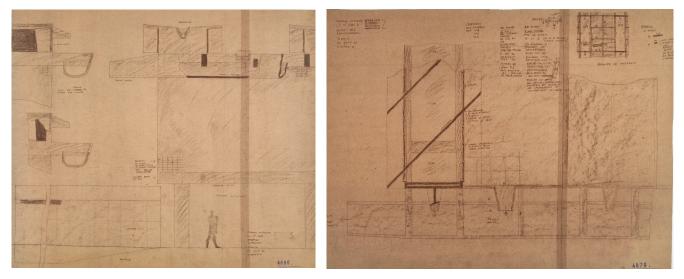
Archival drawing showing details for terrace draining; (L) Undated, (R) 1953. Source: FLC Archive
